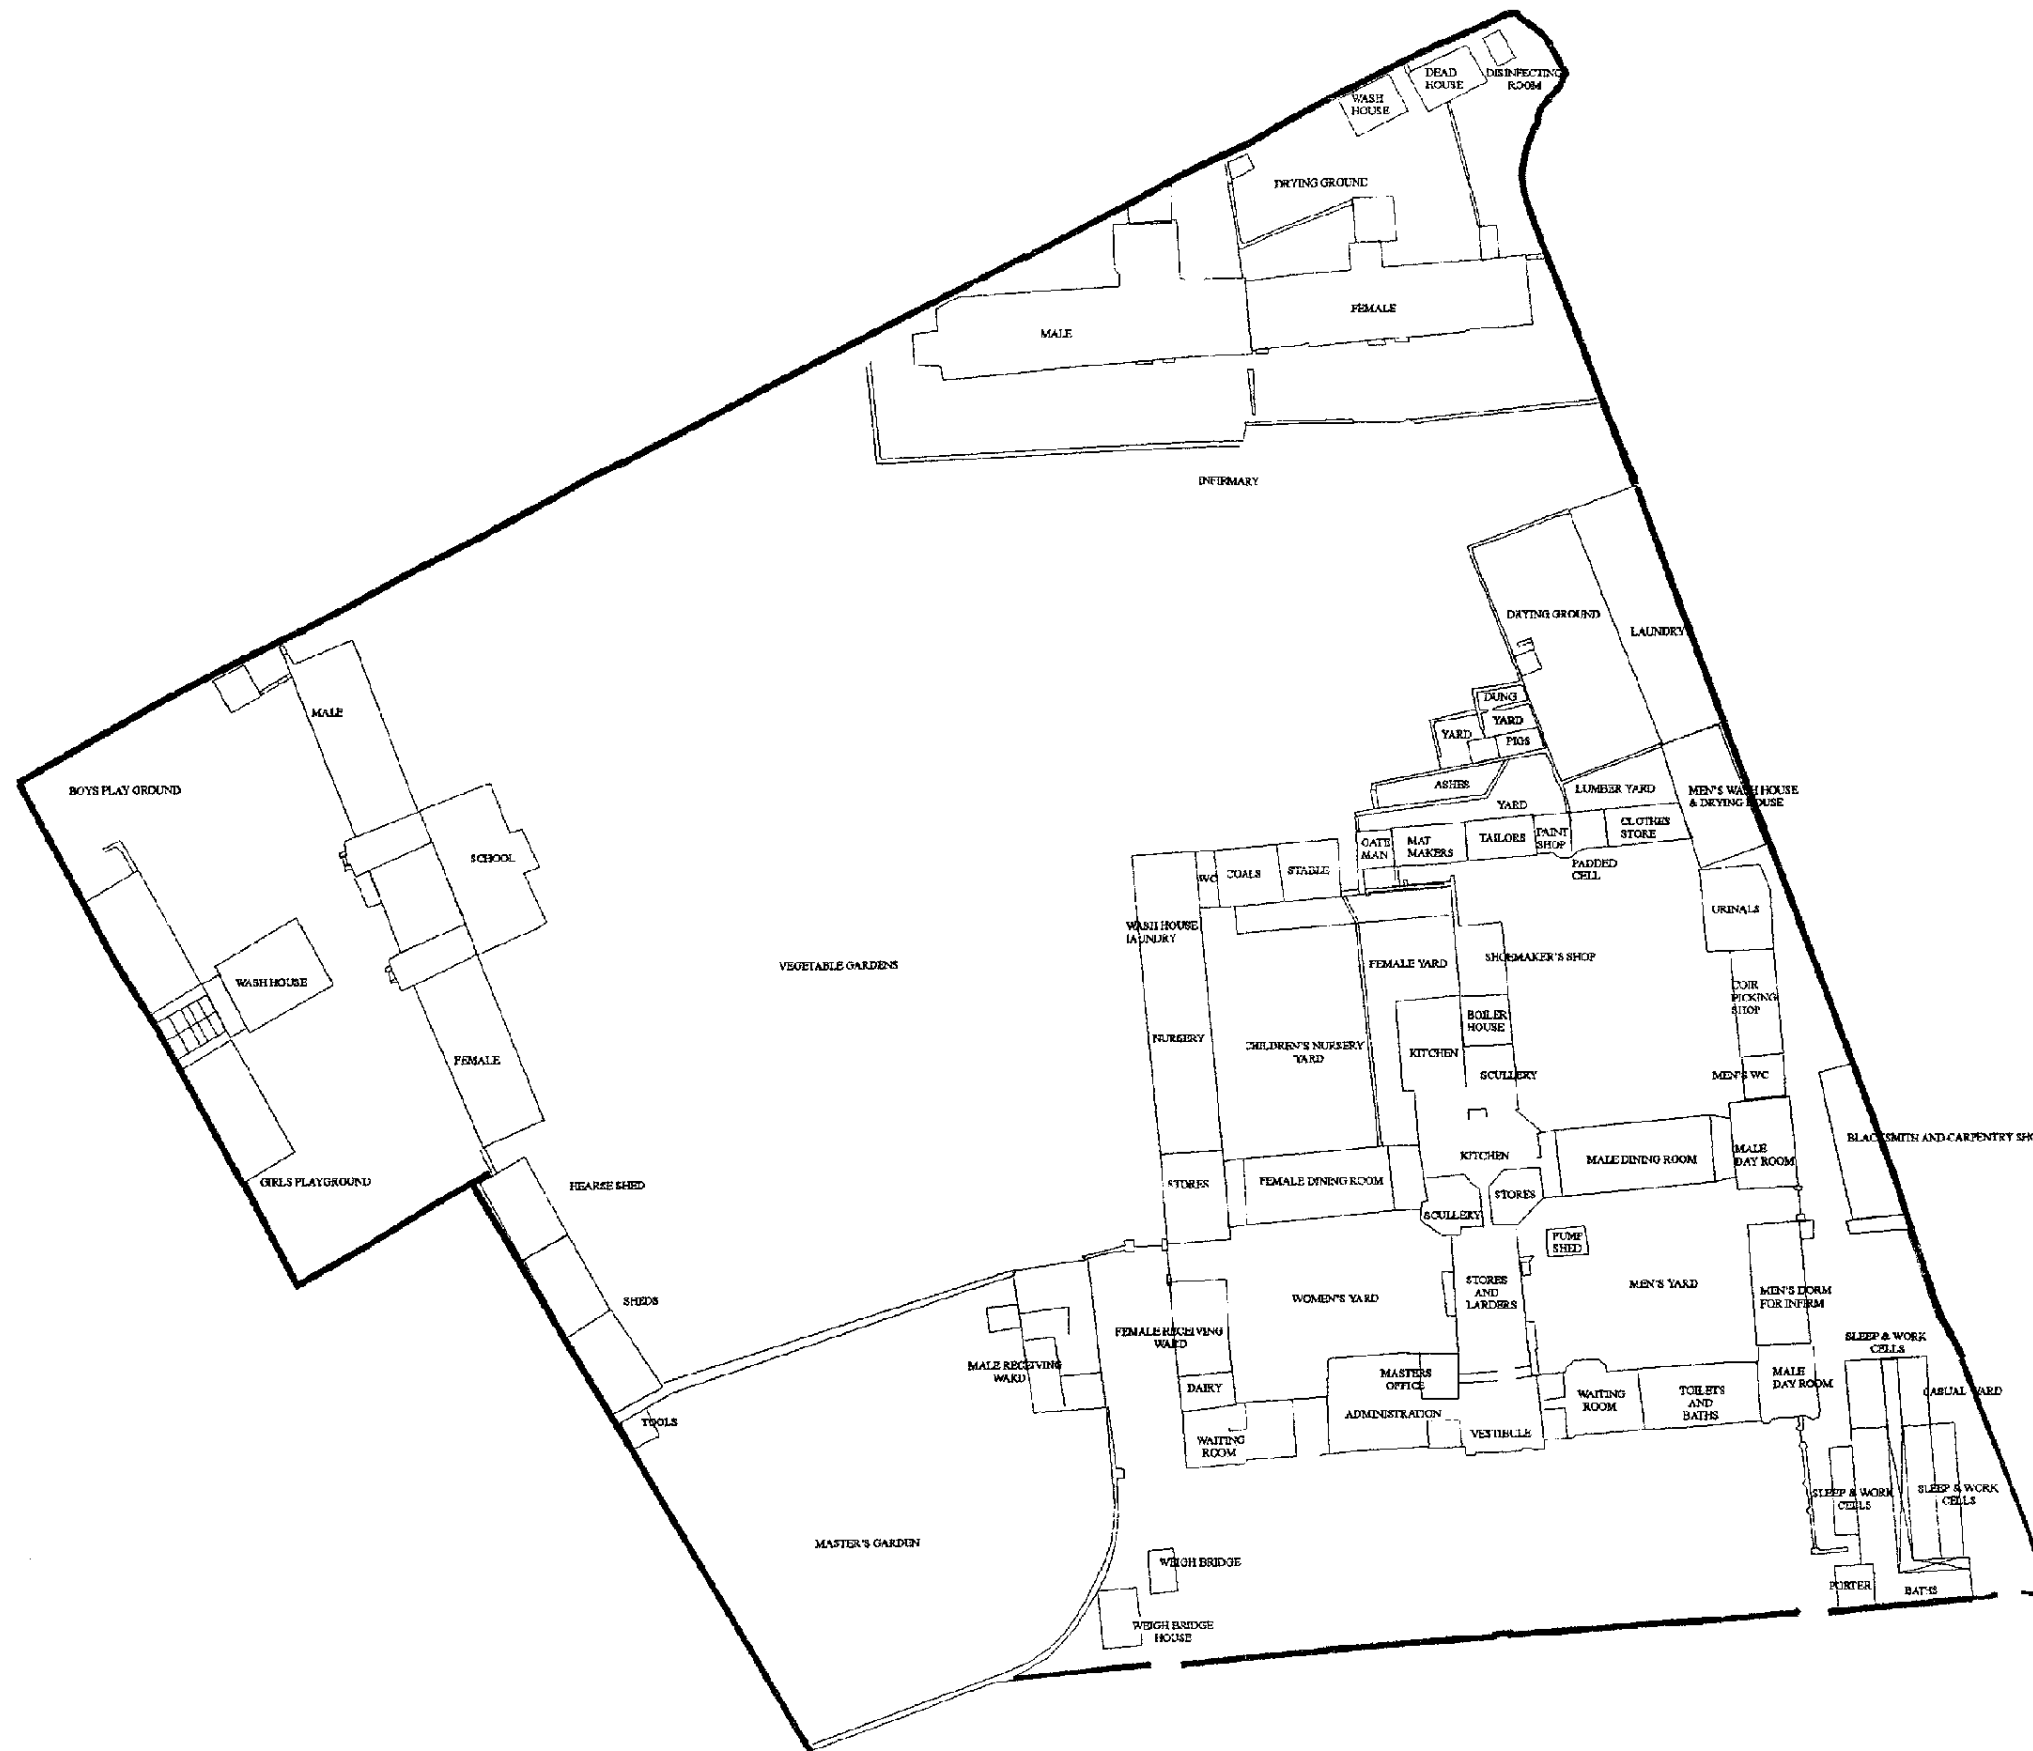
Workhouse: ground floor plan, 1897, showing use of buildings / rooms (after Henderson 2003, fig. 2)
